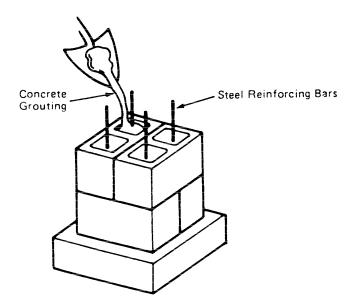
For piers exceeding 80 inches in height the concrete blocks must be filled with concrete grouting and steel reinforcing rods Figure A--4. utilized.
